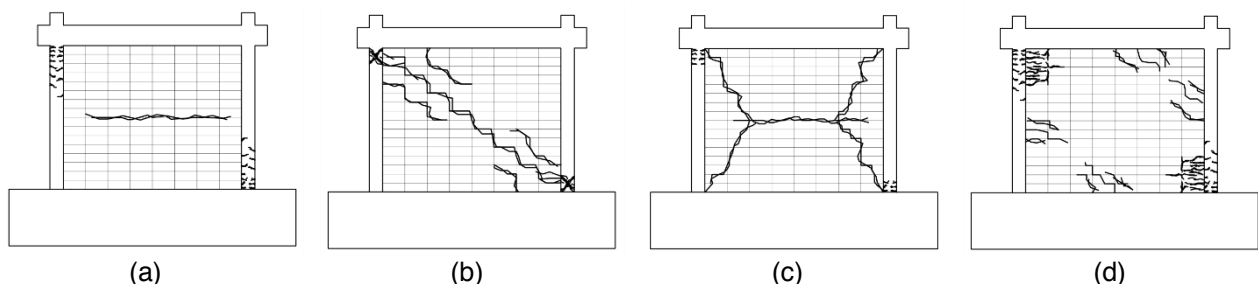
Failure mechanisms of infills (a) mid-height sliding, (b) diagonal cracking, (c) bed joint sliding, and (d) corner crushing.
